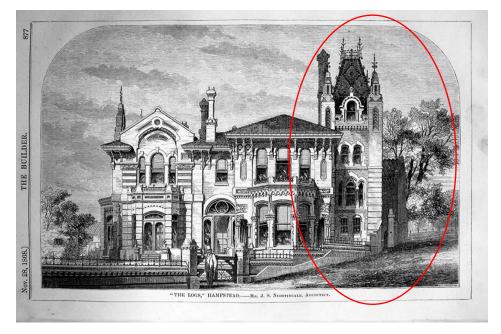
1868 Original Entrance Elevation. Number 17 comprises the tower element of the original house.
